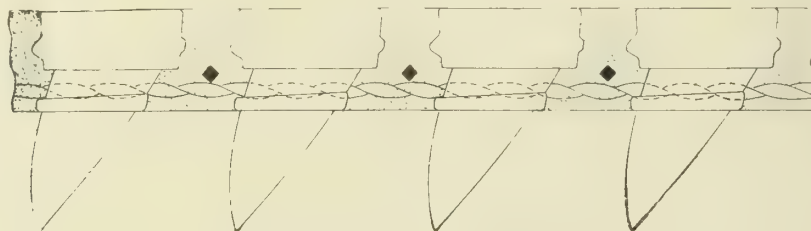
SIDEWALK PRISMS, SECTIONAL VIEW
